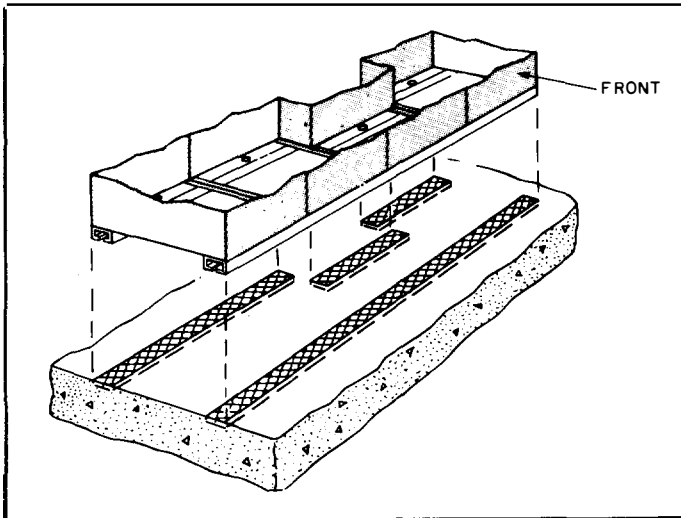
Installing steel floor members (Note front line-up of 13-inch [330.2 mm] deep section.
